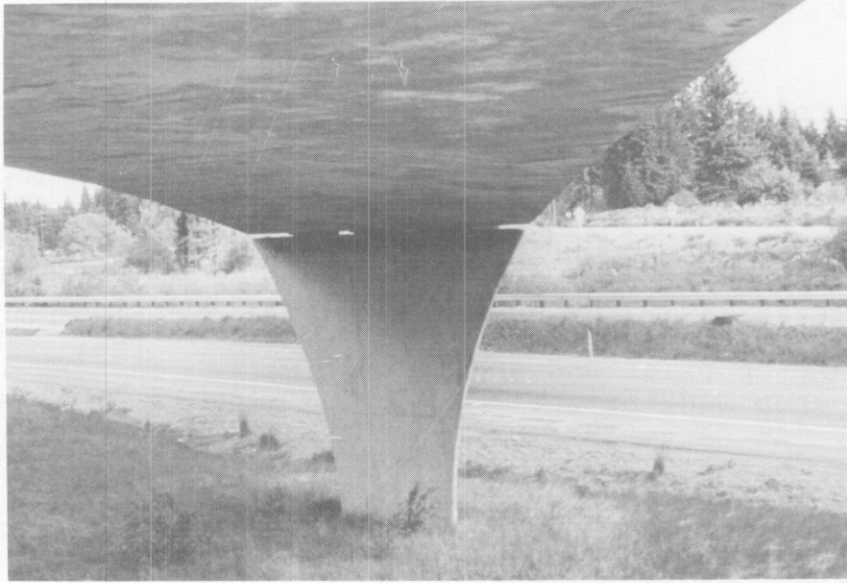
Evergreen Parkway Pier #2 and Underside of Box Girder
